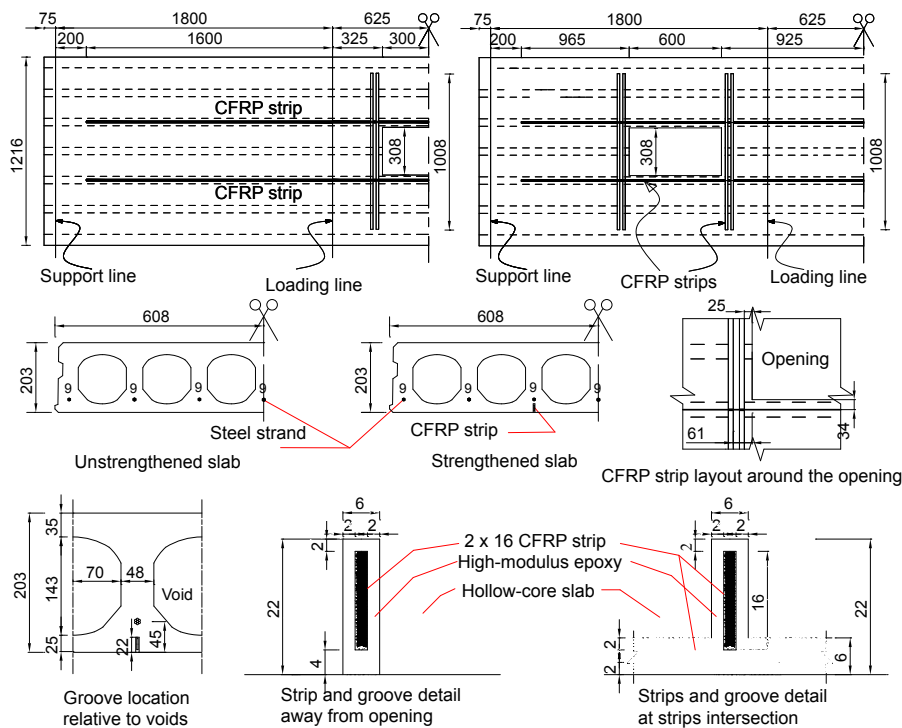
Details and cross section of test slabs and groove details near the voids. Note: CFRP = carbon-fiber-reinforced polymer. All dimensions are in millimeters. 1 mm = 0.0394 in.
